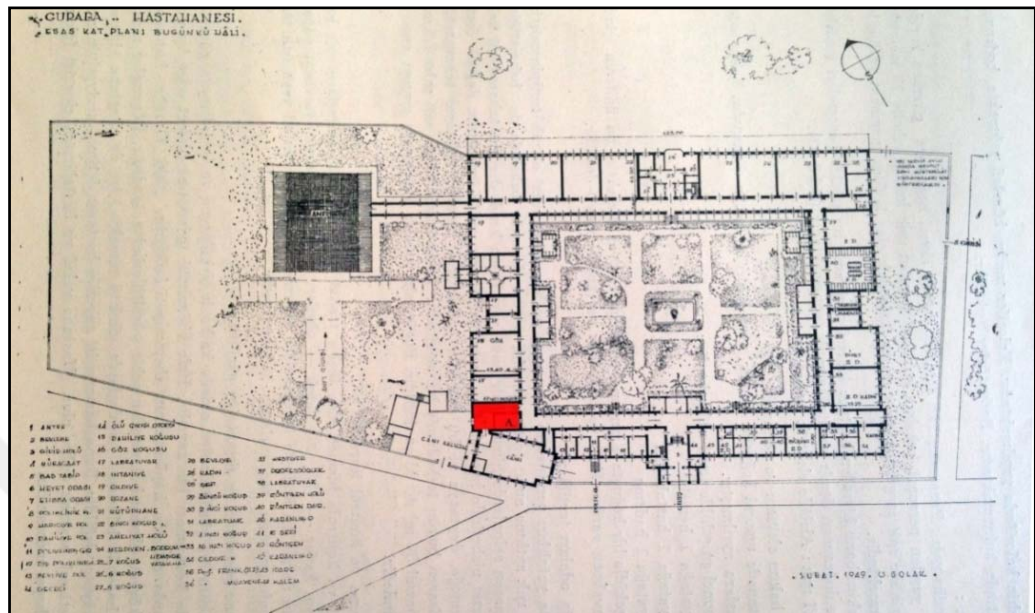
Ground Floor Plan of Gureba Hospital (Bolak, 1950, 53)
